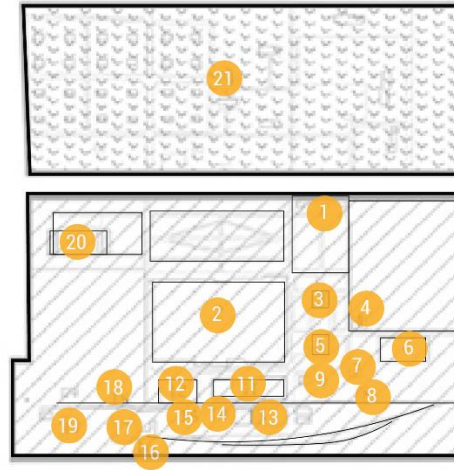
14. Kayseri Cloth Factory Layout Plan (Drawing by Merve Köz, original plan from Eldeş, 2019, p. 37)
